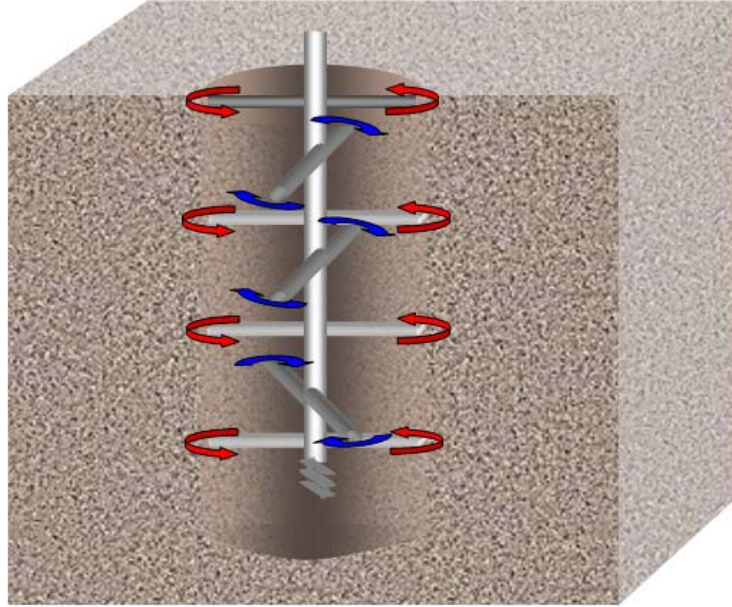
Deep Soil Mixing (DSM) Operation and Extruded DSM Columns
